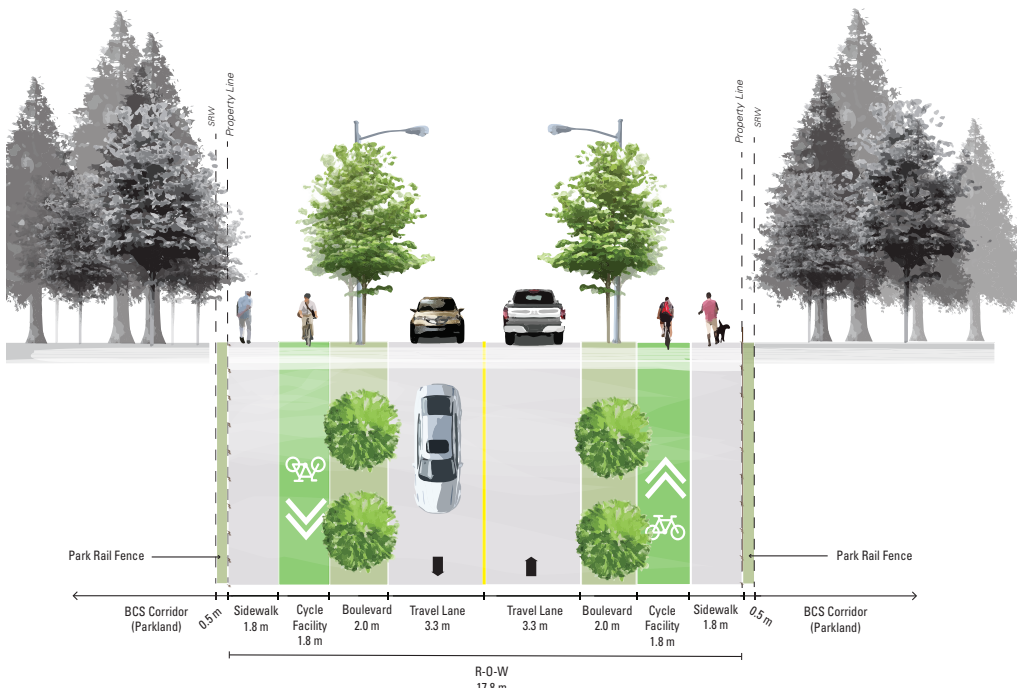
Collector BCS Road Crossing - 17.8 m Cross-section
